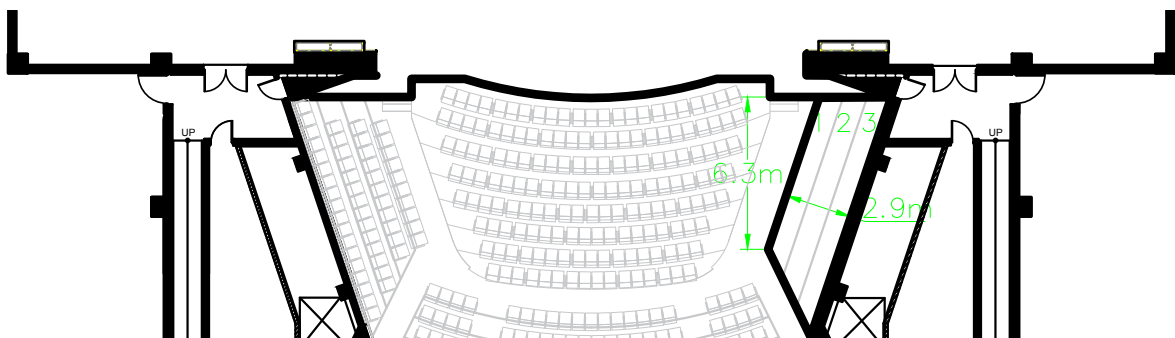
Chinese Orchestra Pit (Side Auditorium Platform) location plan
